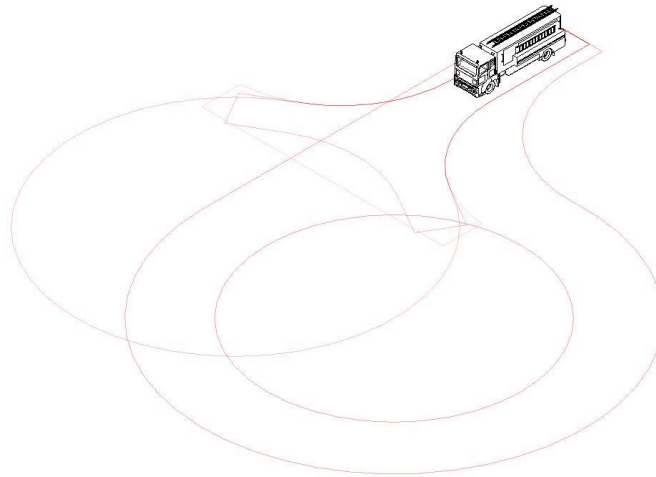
BIM Object, Firetruck with Parametric Turn Around options
